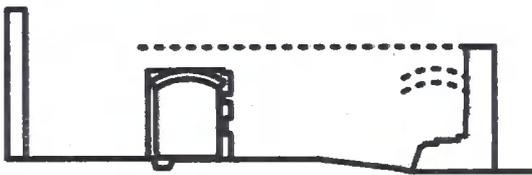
Crack monitoring points and construction materials. Ambel north east tower internal elevation of the west face of the east wall. Inverted to match external elevation.
